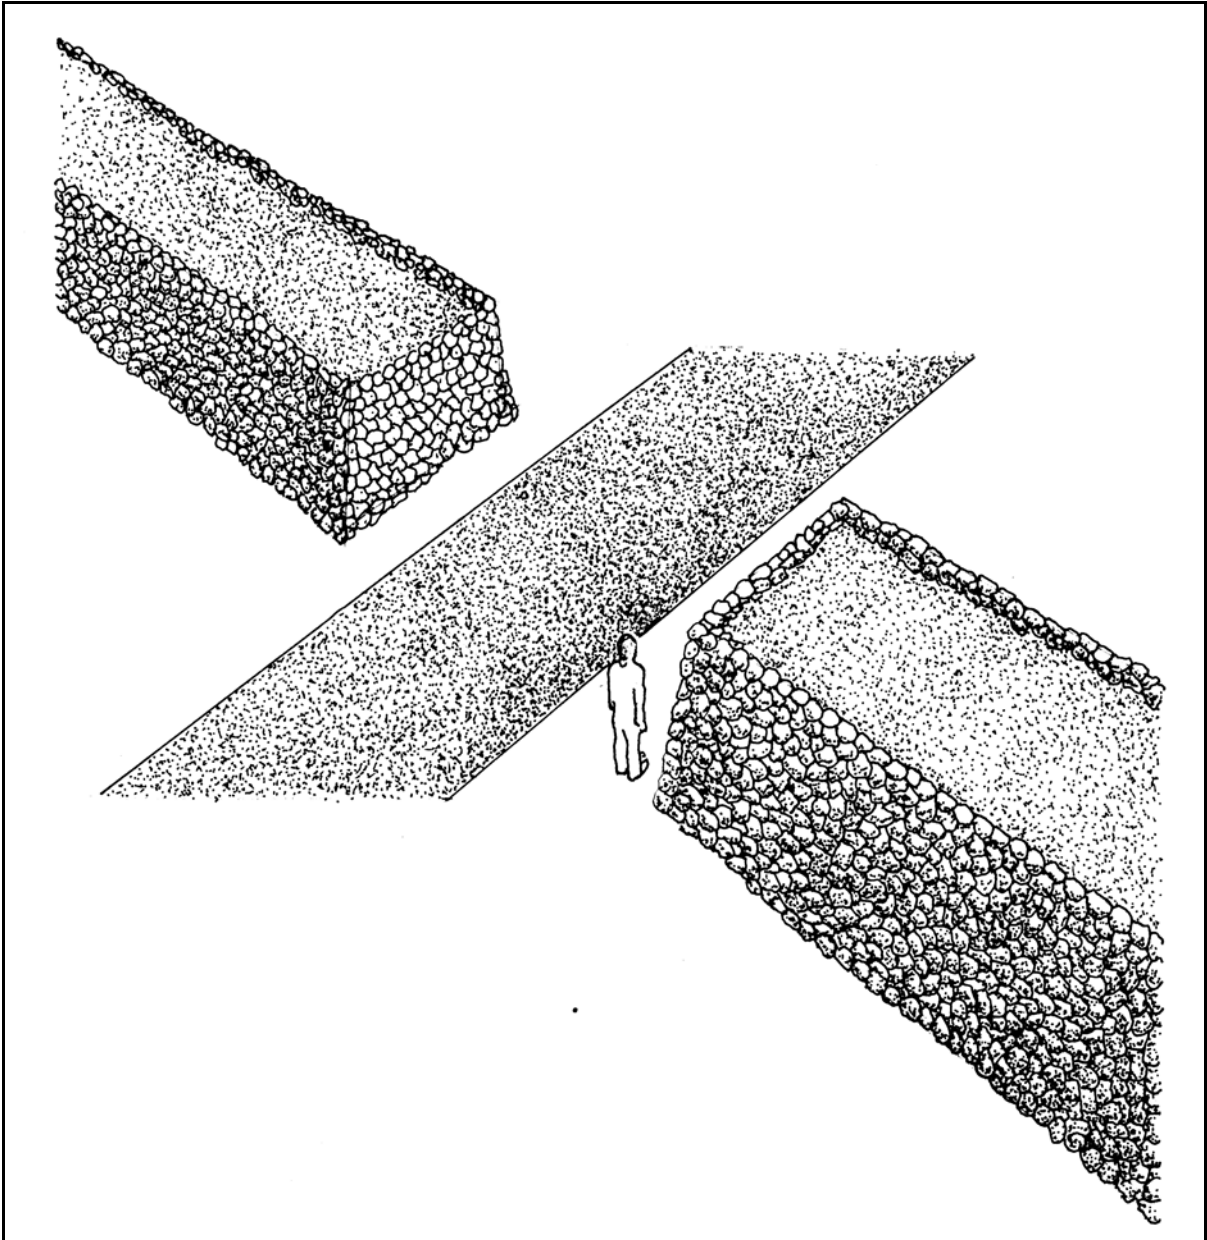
Schematic of railroad berm (site 947) and access road after reconstruction
